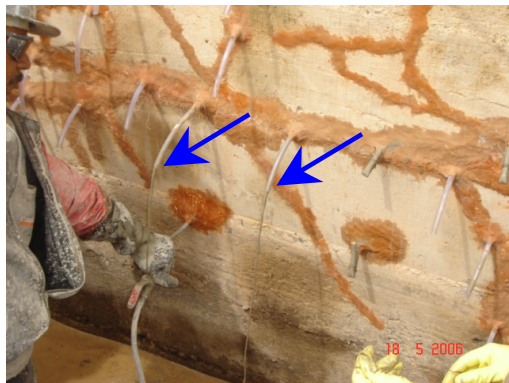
Grout injection through lower purges, where the arrows show the exit of the grout indicating that the cracks were filled.
